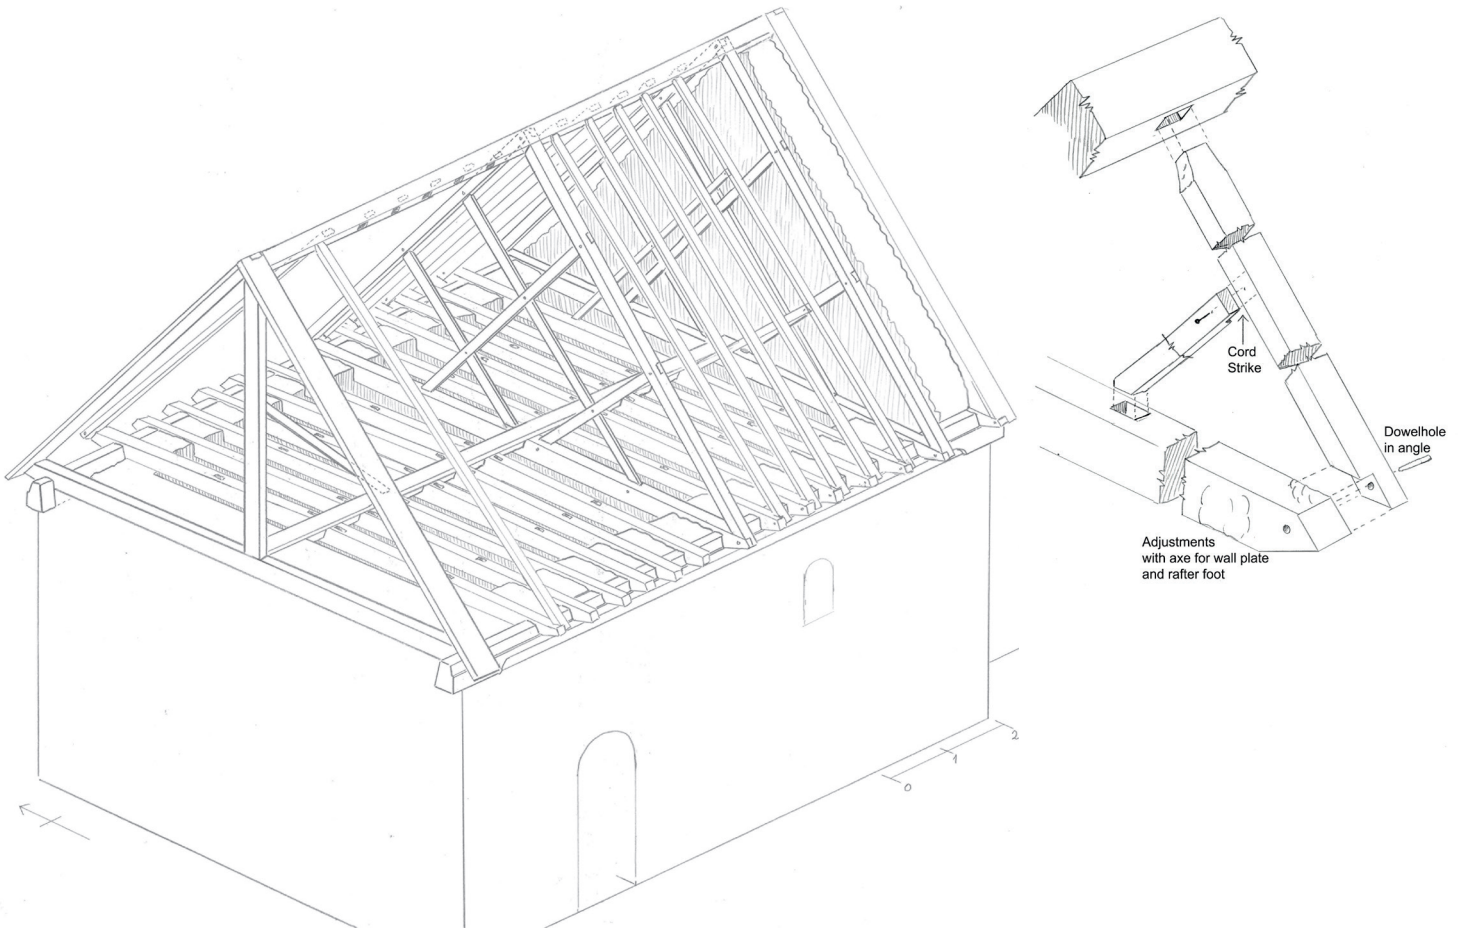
Isometric reconstruction of the nave roof of Valtorp (1200–1204 d) halfway through the building process. The tiebeams mounted, steering-beam laid, king post and two primary trusses erected, ridge purlin mounted, rafters inserted into the purlin and fixed to the tiebeams in the east half, insertion of struts has just started. Drawings by the author.
